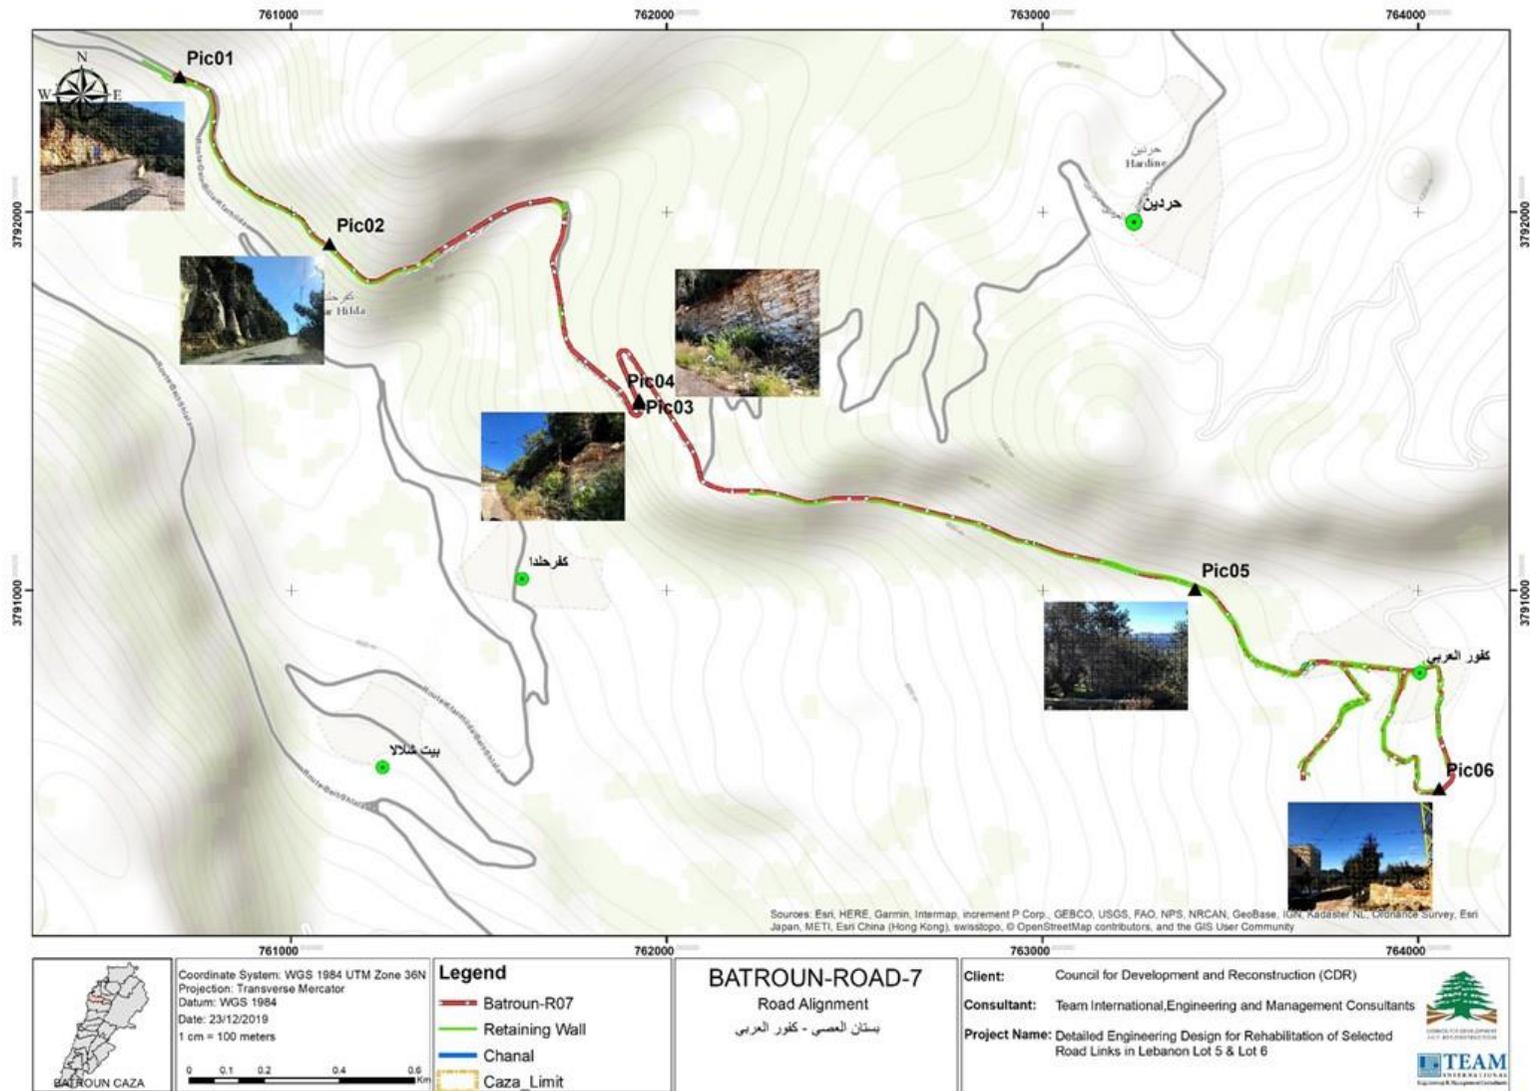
Road alignment of Batroun Road 7N (Bassatin Al Ossi - Kfour Al Arabi) with contour elevations
